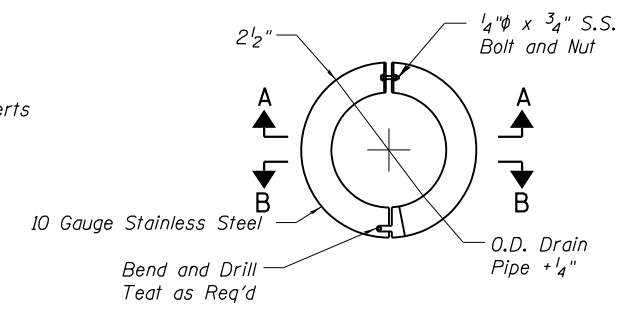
DETAIL A - VERTICAL DRAIN PIPE SUPPORT DETAIL
